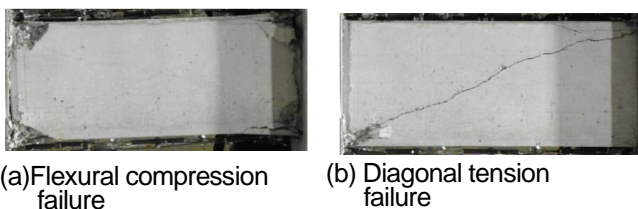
Modes of failure of concrete members with unbonded longitudinal steels<sup>7)</sup>
